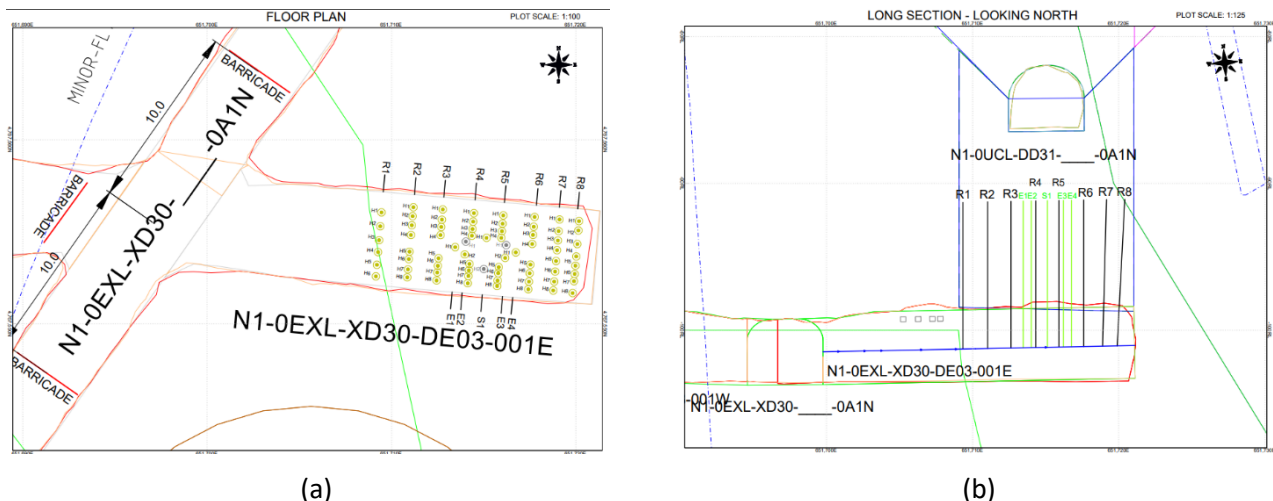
(a) Floor plan of P0 single-sided drawbell; (b) Long section view of P0 single-sided drawbell
